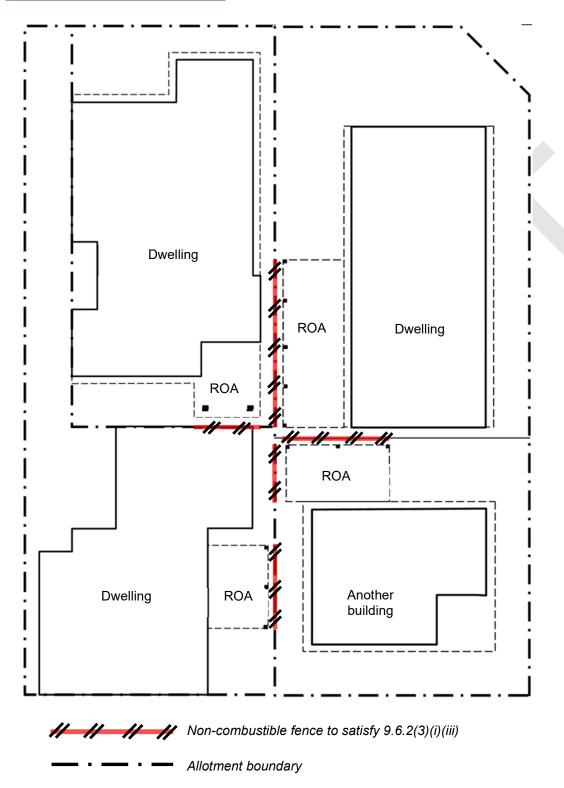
Example locations of fences provided to separate roofed outdoor areas from another building and allotment boundaries
